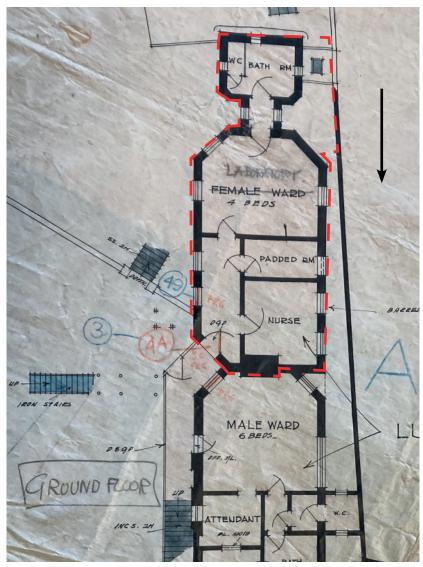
Undated historic plan. Source: London Metropolitan Archives
